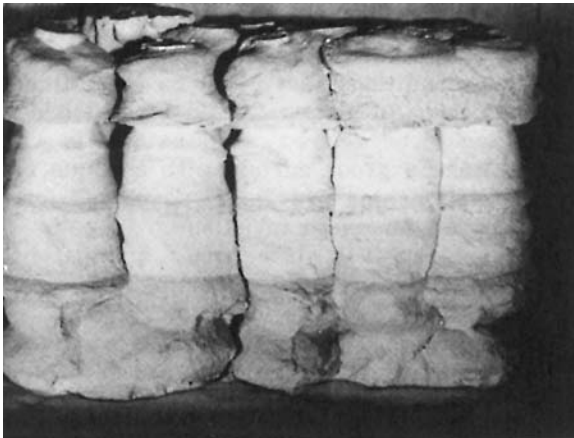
Grout curtain in stratified deposits made with single row or holes.
